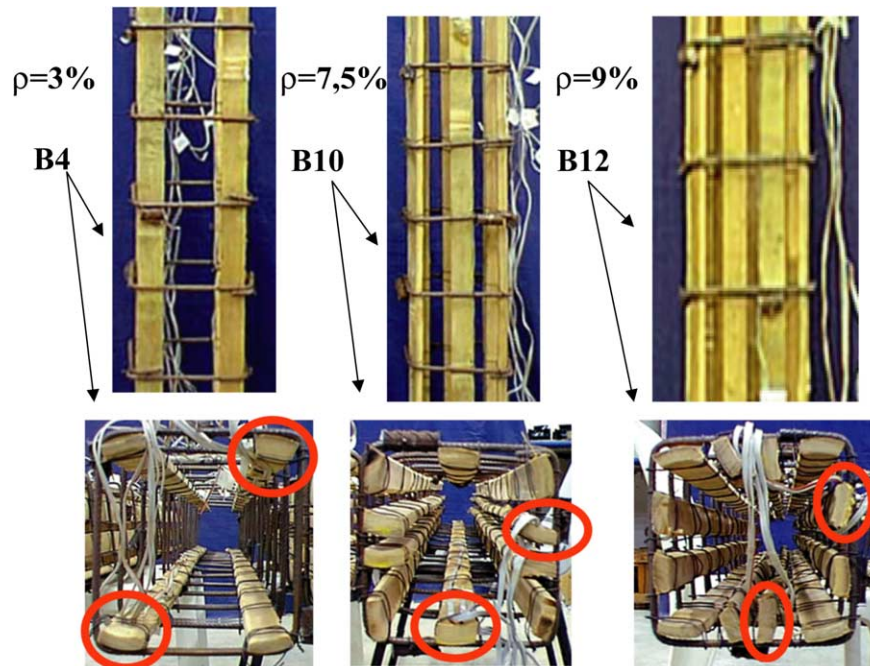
Details of rectangular concrete column reinforced with treated bamboo.
